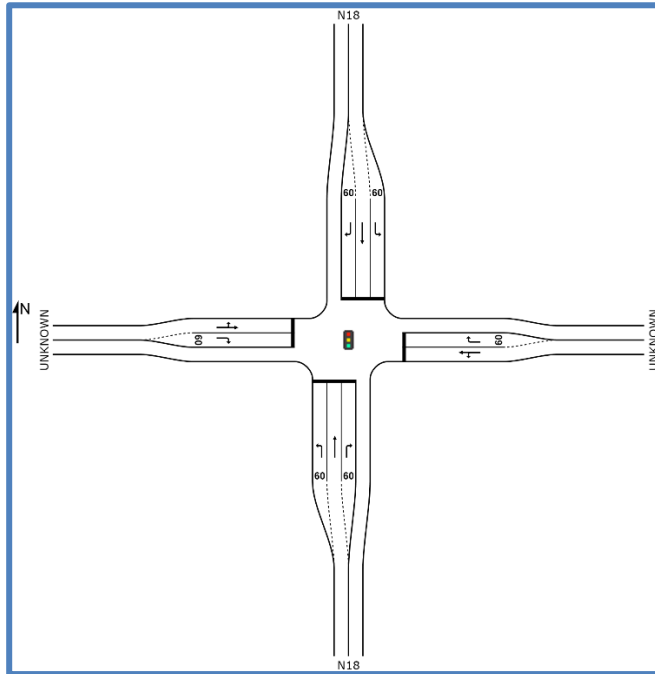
Proposed Layout of N18 and Nelson Mandela Street Intersection
